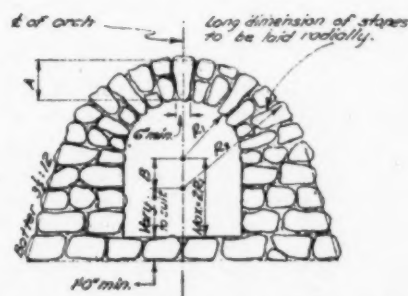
Typical section of 3-ft. to 6-ft. rubble masonry arch culvert
